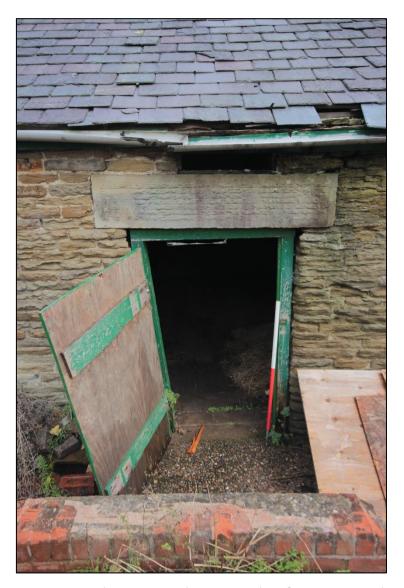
Doorway on the western elevation, taken facing east with 1m scale.
